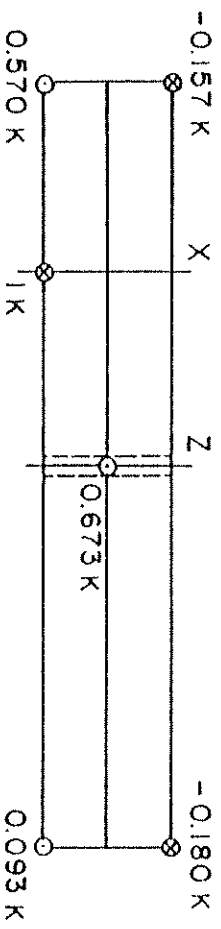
SUPPORT REACTIONS FOR TWO SPAN STRAIGHT AND SKEW BOX GIRDERS UNDER POINT LOAD ON EXTERIOR GIRDER IN ONE SPAN
